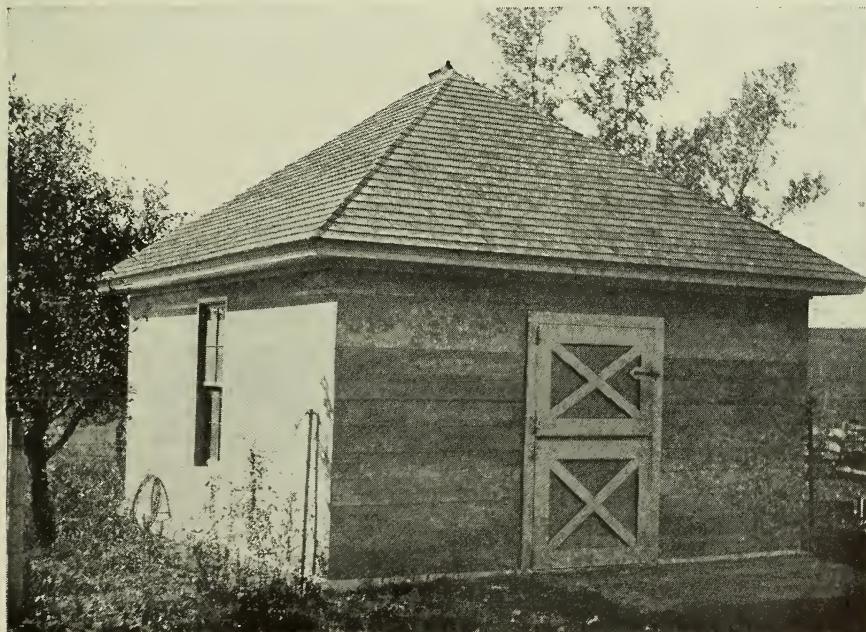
Monolithic Blacksmith Shop, Echo Valley Farm, Odebolt, Iowa. A convenient building equipped to take care of horse shoeing, wagon and implement repairs, and other forge and machine work required about the farm. Dimensions, 16 feet by 18 feet. Built by the owner, 1908.
